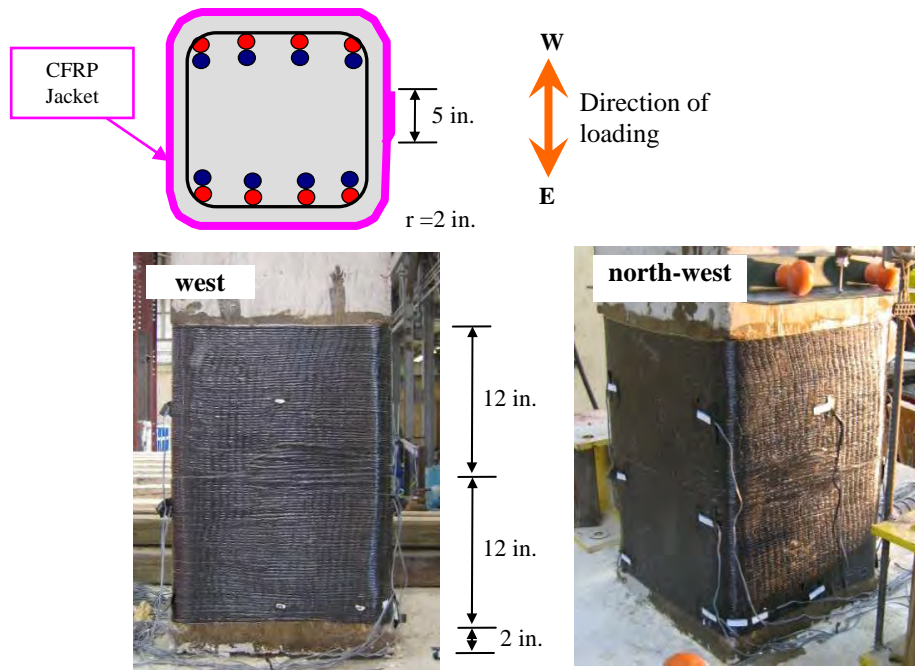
CFRP jacket for column with poor lap splices (Kim, 2008)
